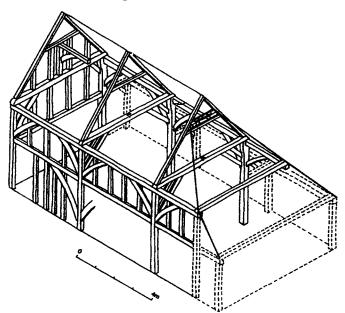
Reconstruction of the Bocking Hall outbuilding in its first phase.
